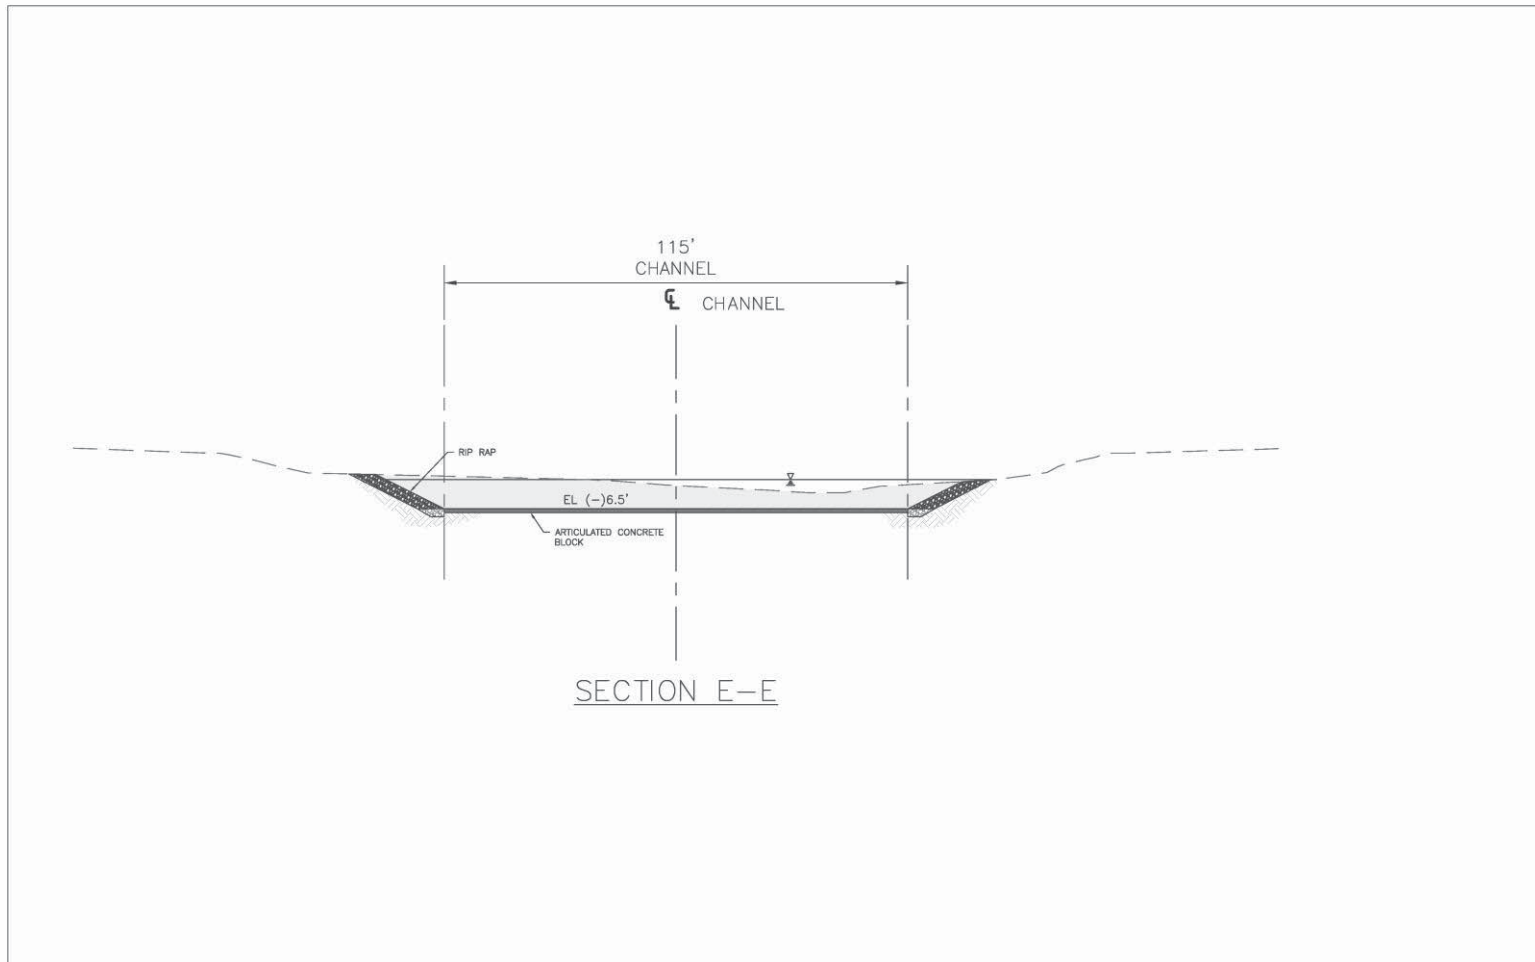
Cross Section E-E, Tren Urbano Bridge
